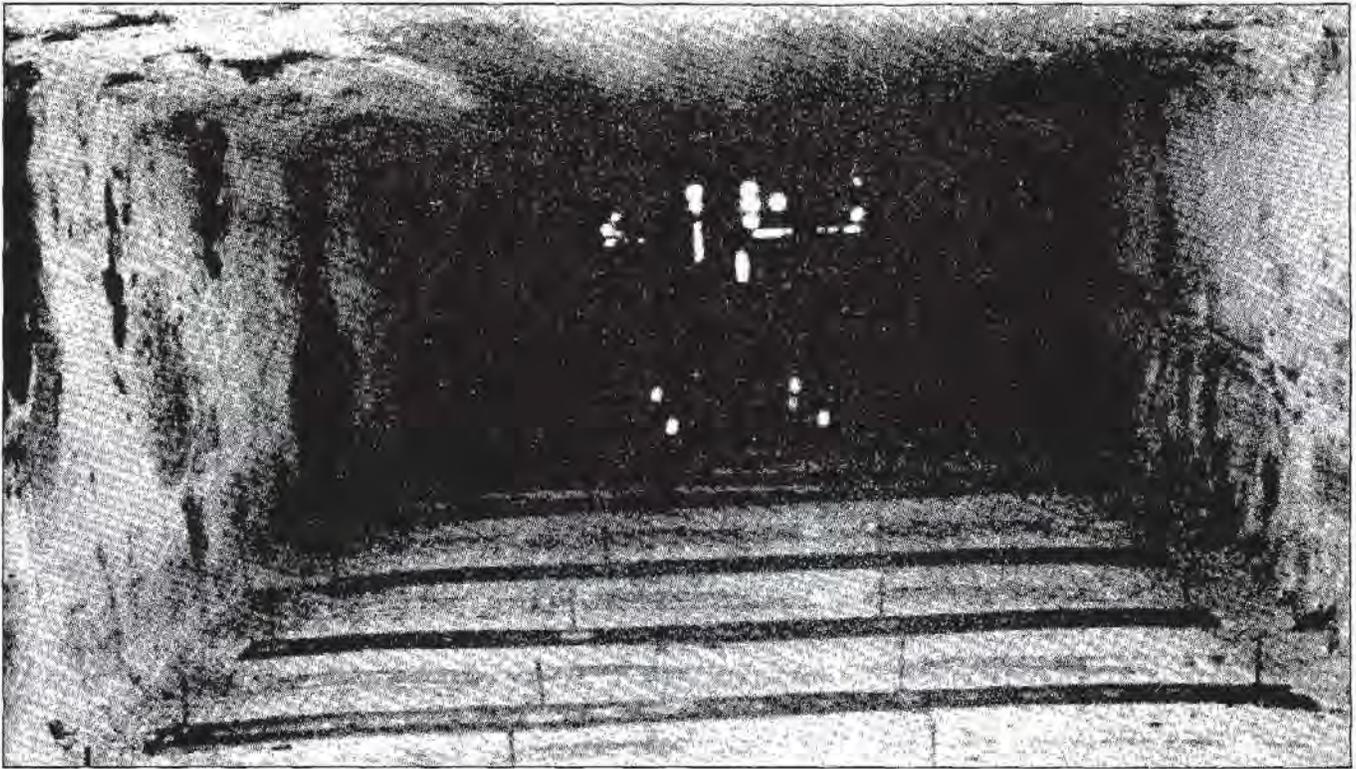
Resin-grouted cable test area immediately after cable support installation (before first panel mining).
